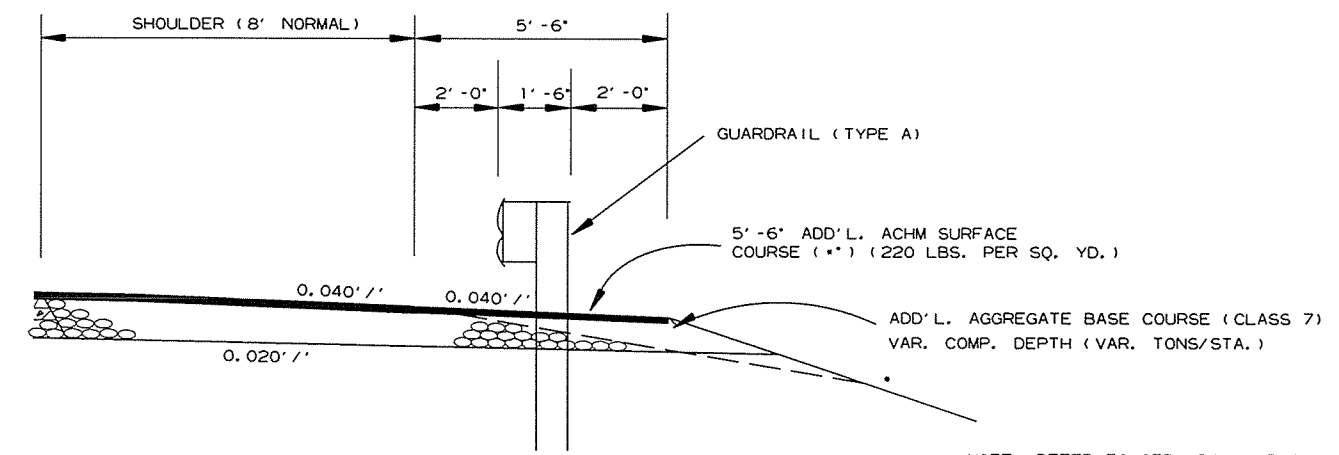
DETAIL FOR COUNTY ROAD TURNOUTS OPEN SHOULDER SECTION
